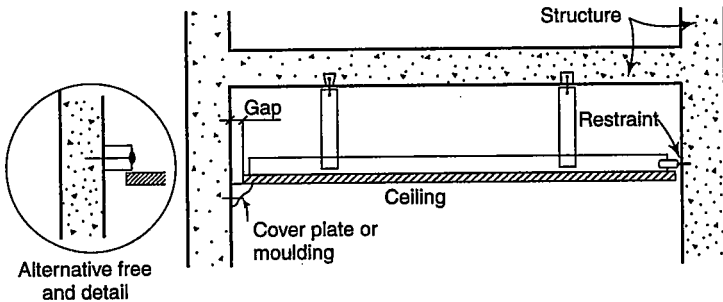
Details at periphery of suspended ceilings to prevent hammering and excessive movement (Berry 1972)
